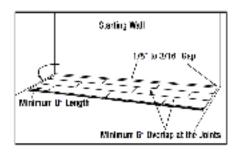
Stagger end joints by 6" (15.24 cm), cut pieces at ends of row should be 8" (20.32 cm) or greater for planks.
